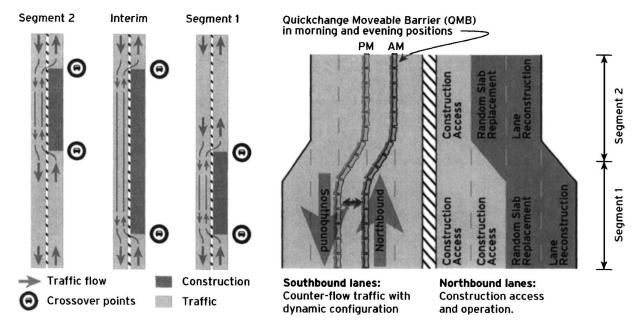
Progressive construction staging plan and lane closure scheme with construction access
